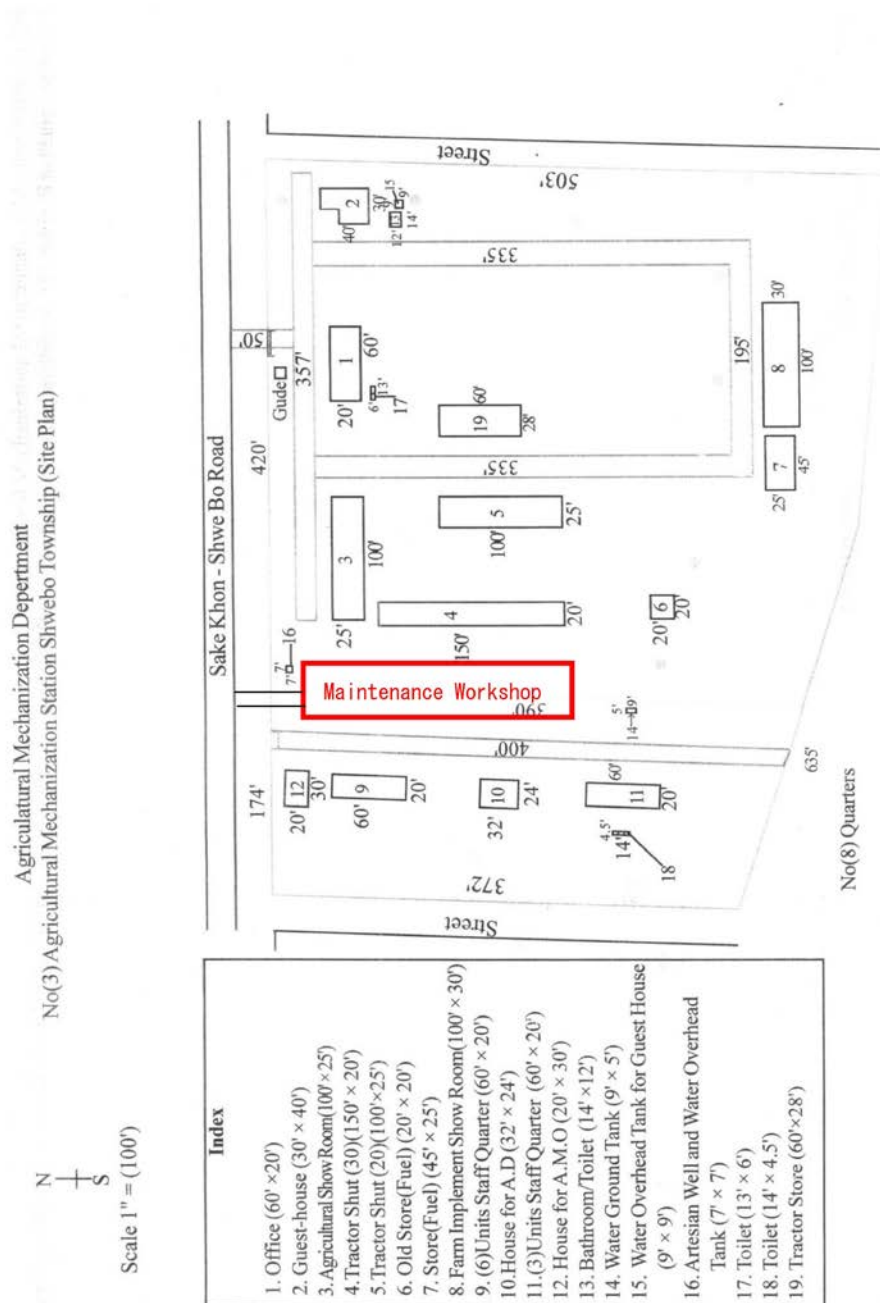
Site Plan of Maintenance Workshop at AMS No.3 (Shwebo)
